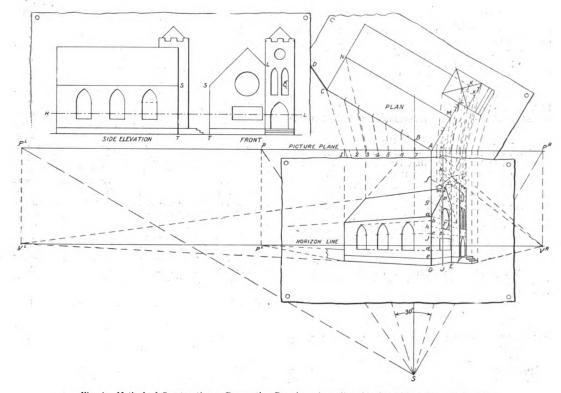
Method of Constructing a Perspective Drawing According to the "Plan Above" System.
